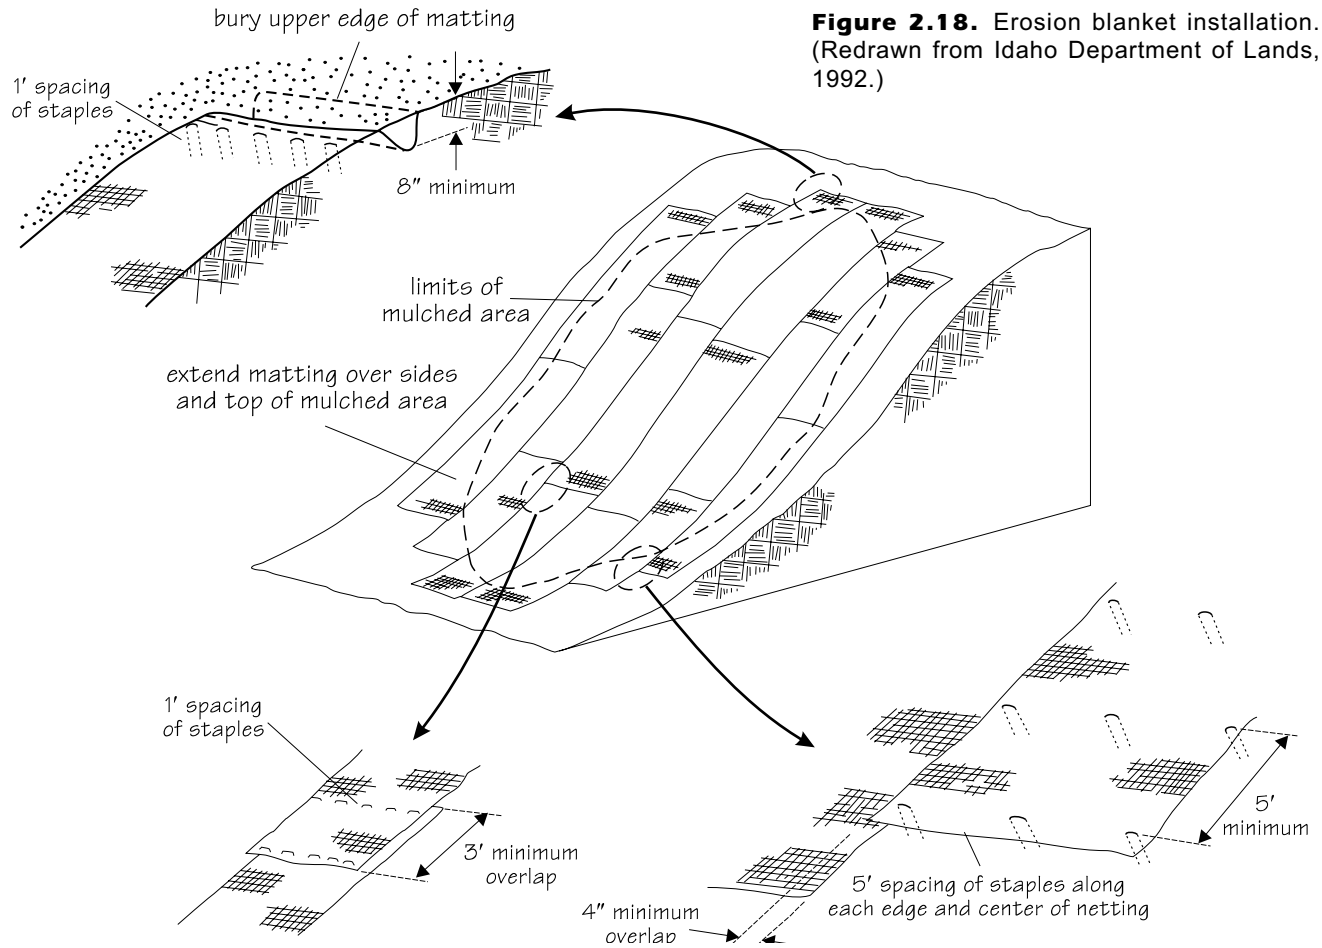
Erosion blanket installation. (Redrawn from Idaho Department of Lands, 1992.)
